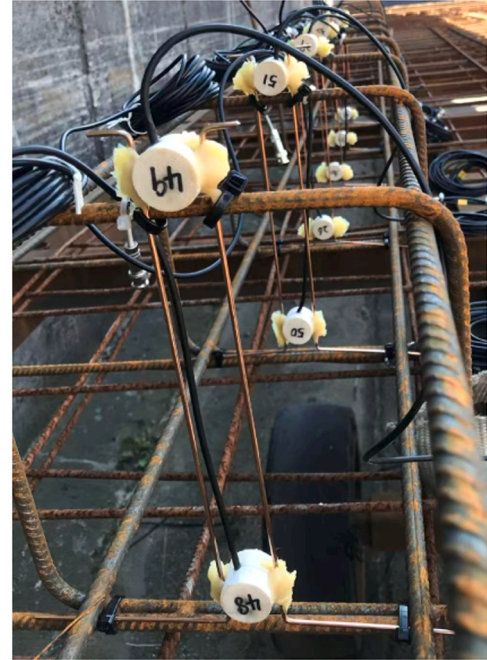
Photo of the installed sensors in the rebar cage before concrete casting.
